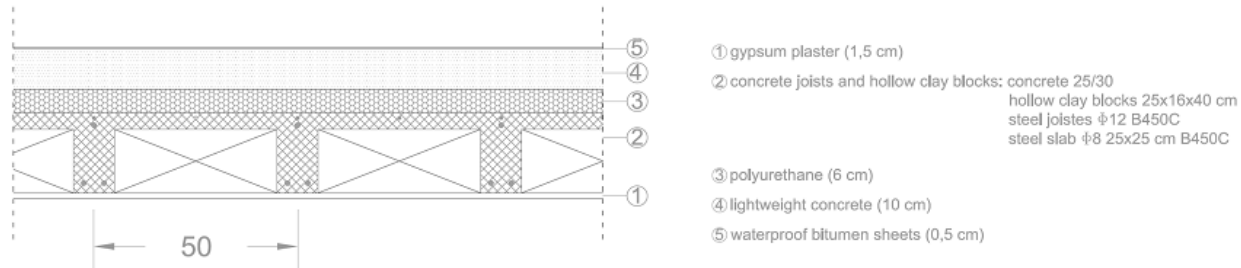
Concrete joists and hollow clay blocks – Cross Section
